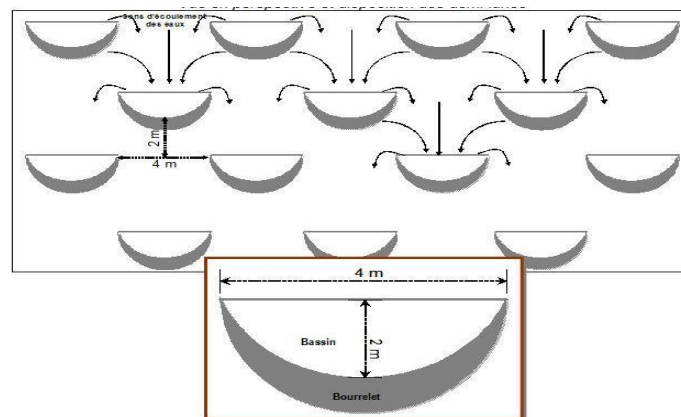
Technical drawing of half-moon (Wocat, 2014)
